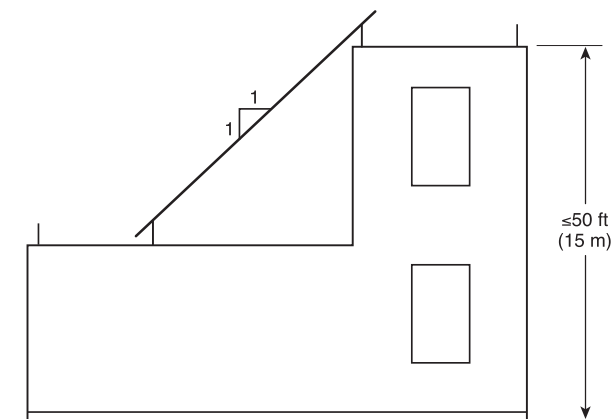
(a) Lower Roof Protection for Buildings 50 ft (15 m) or Less in Height.
